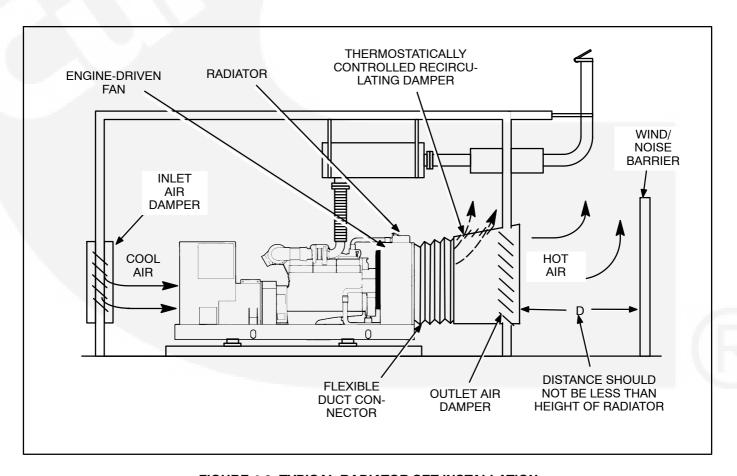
TYPICAL RADIATOR SET INSTALLATION
